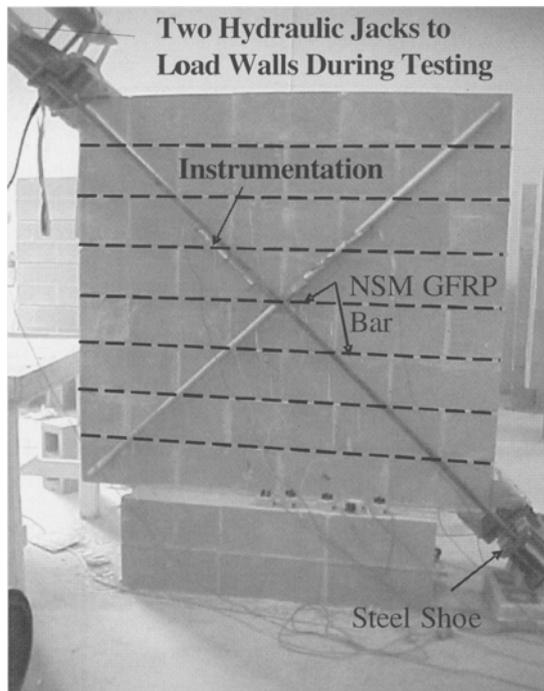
Testing of retrofitted masonry walls with prestressed NSM GFRP bars
